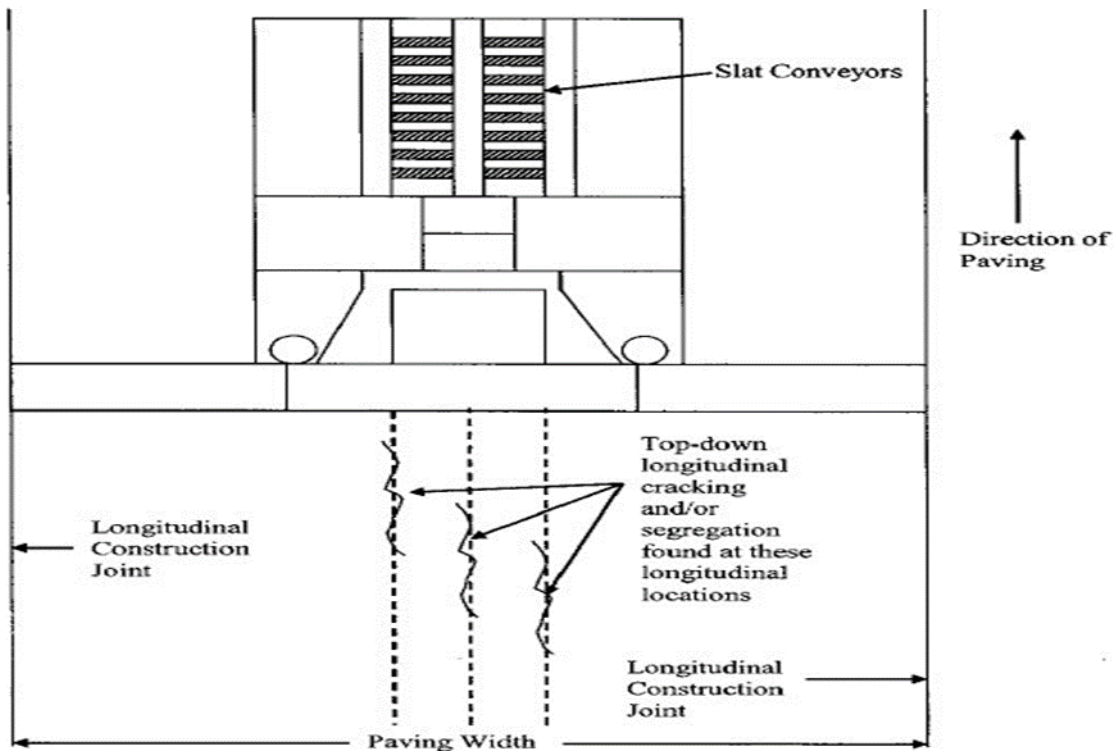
Paver top view and associated top-down longitudinal cracks (Harmelink et al., 2008)
